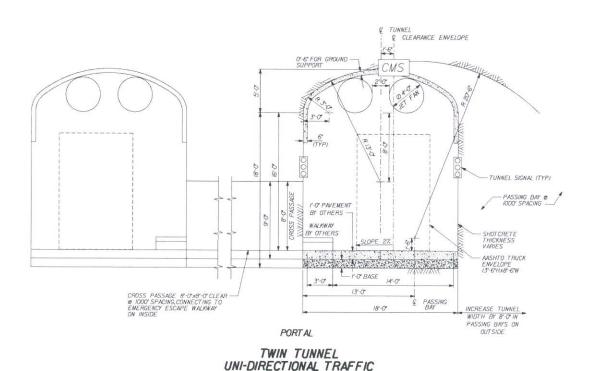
Layout of Twin Uni-Directional Tunnel
